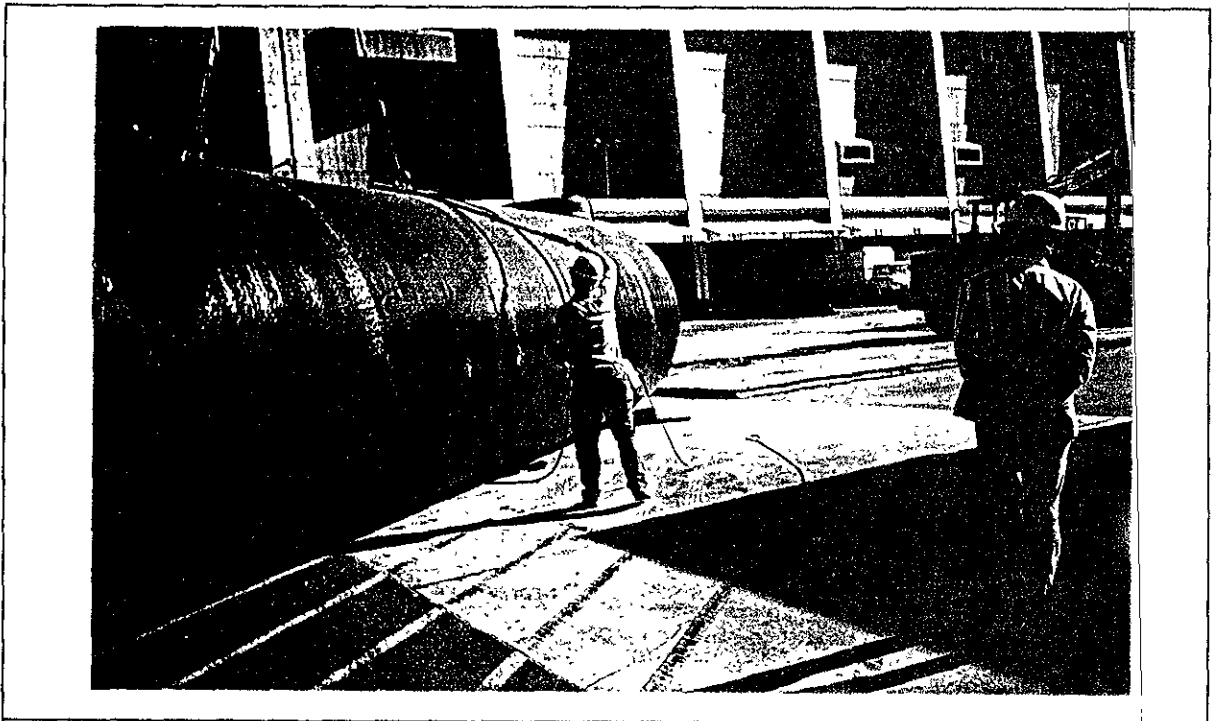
Photo L : Soap-test inspection of the 12,000-gallon UST prior to placement into excavation.
